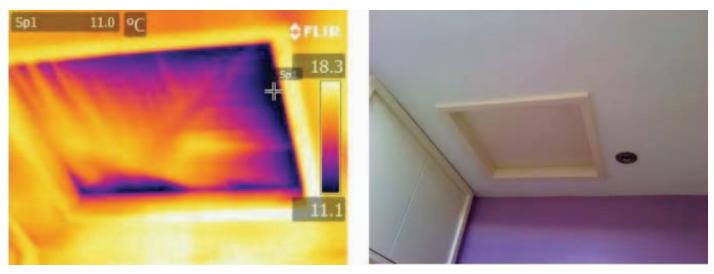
White House Farm, Stirton, Skipton. Ingress around loft hatch in main bathroom.
